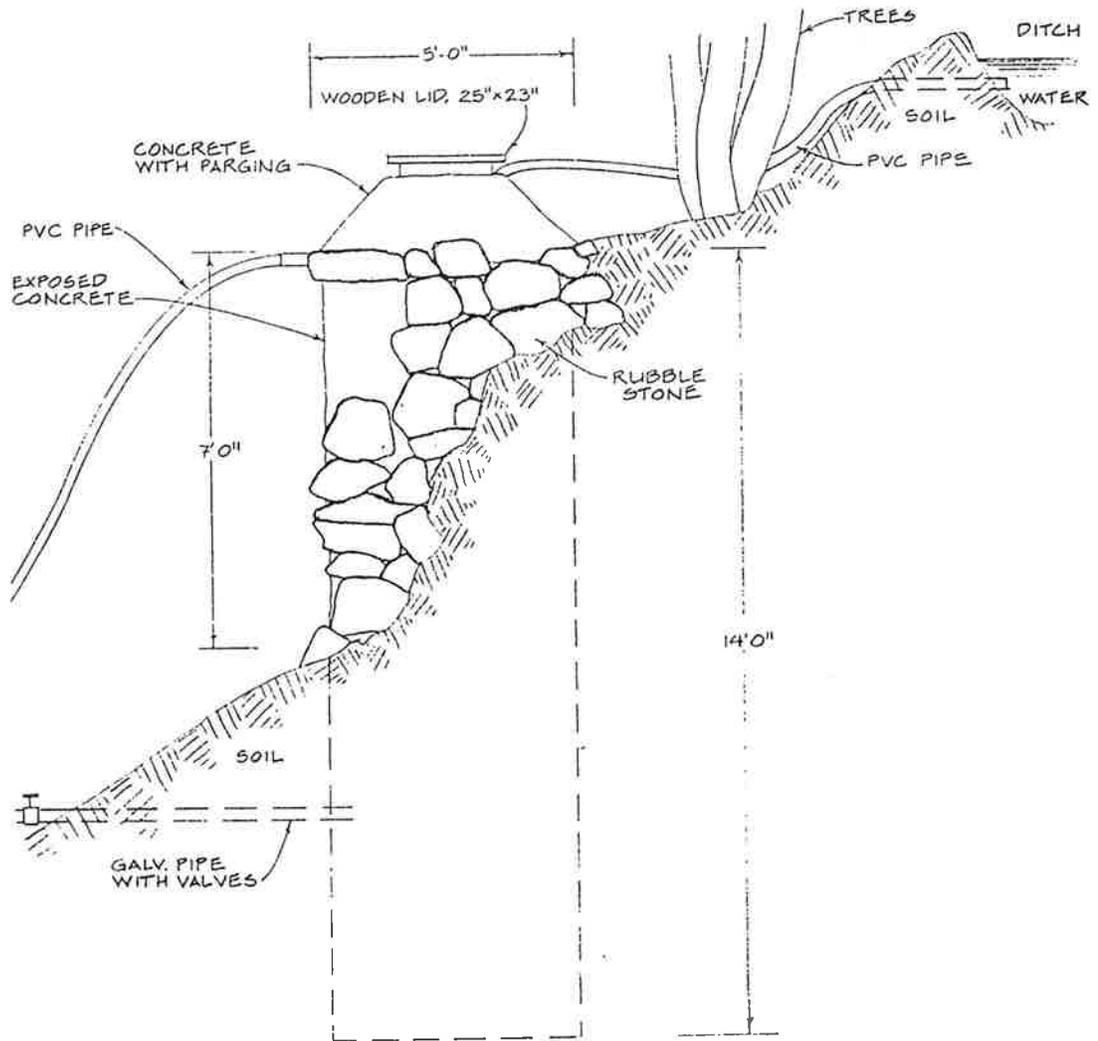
Birch Creek cistern, sketch of north elevation (not to scale).
